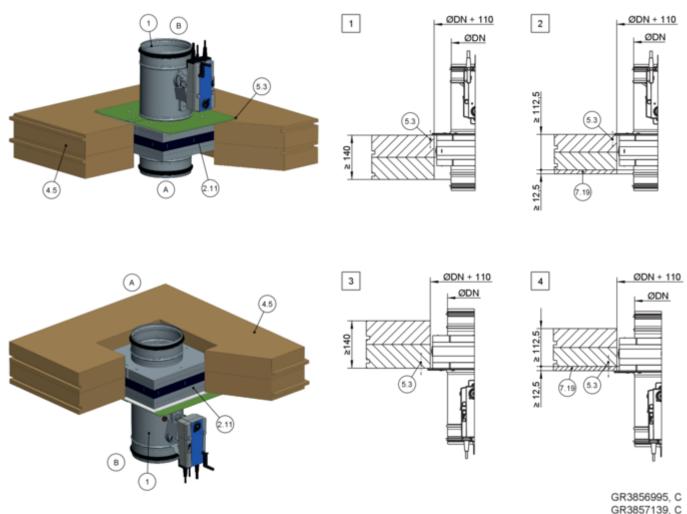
Dry mortarless installation with installation kit TQ2 into solid wood ceiling, upright and suspended
